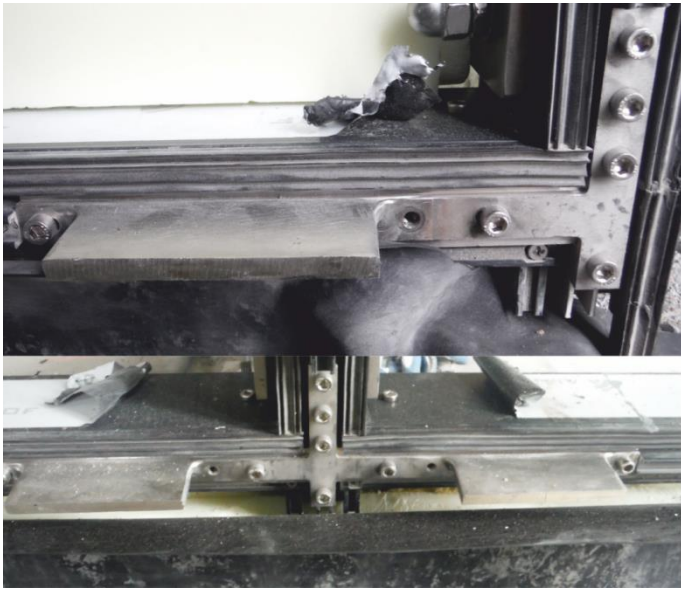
Application of the stainless steel cross shaped windows panel supports in mullion-transom wall system
